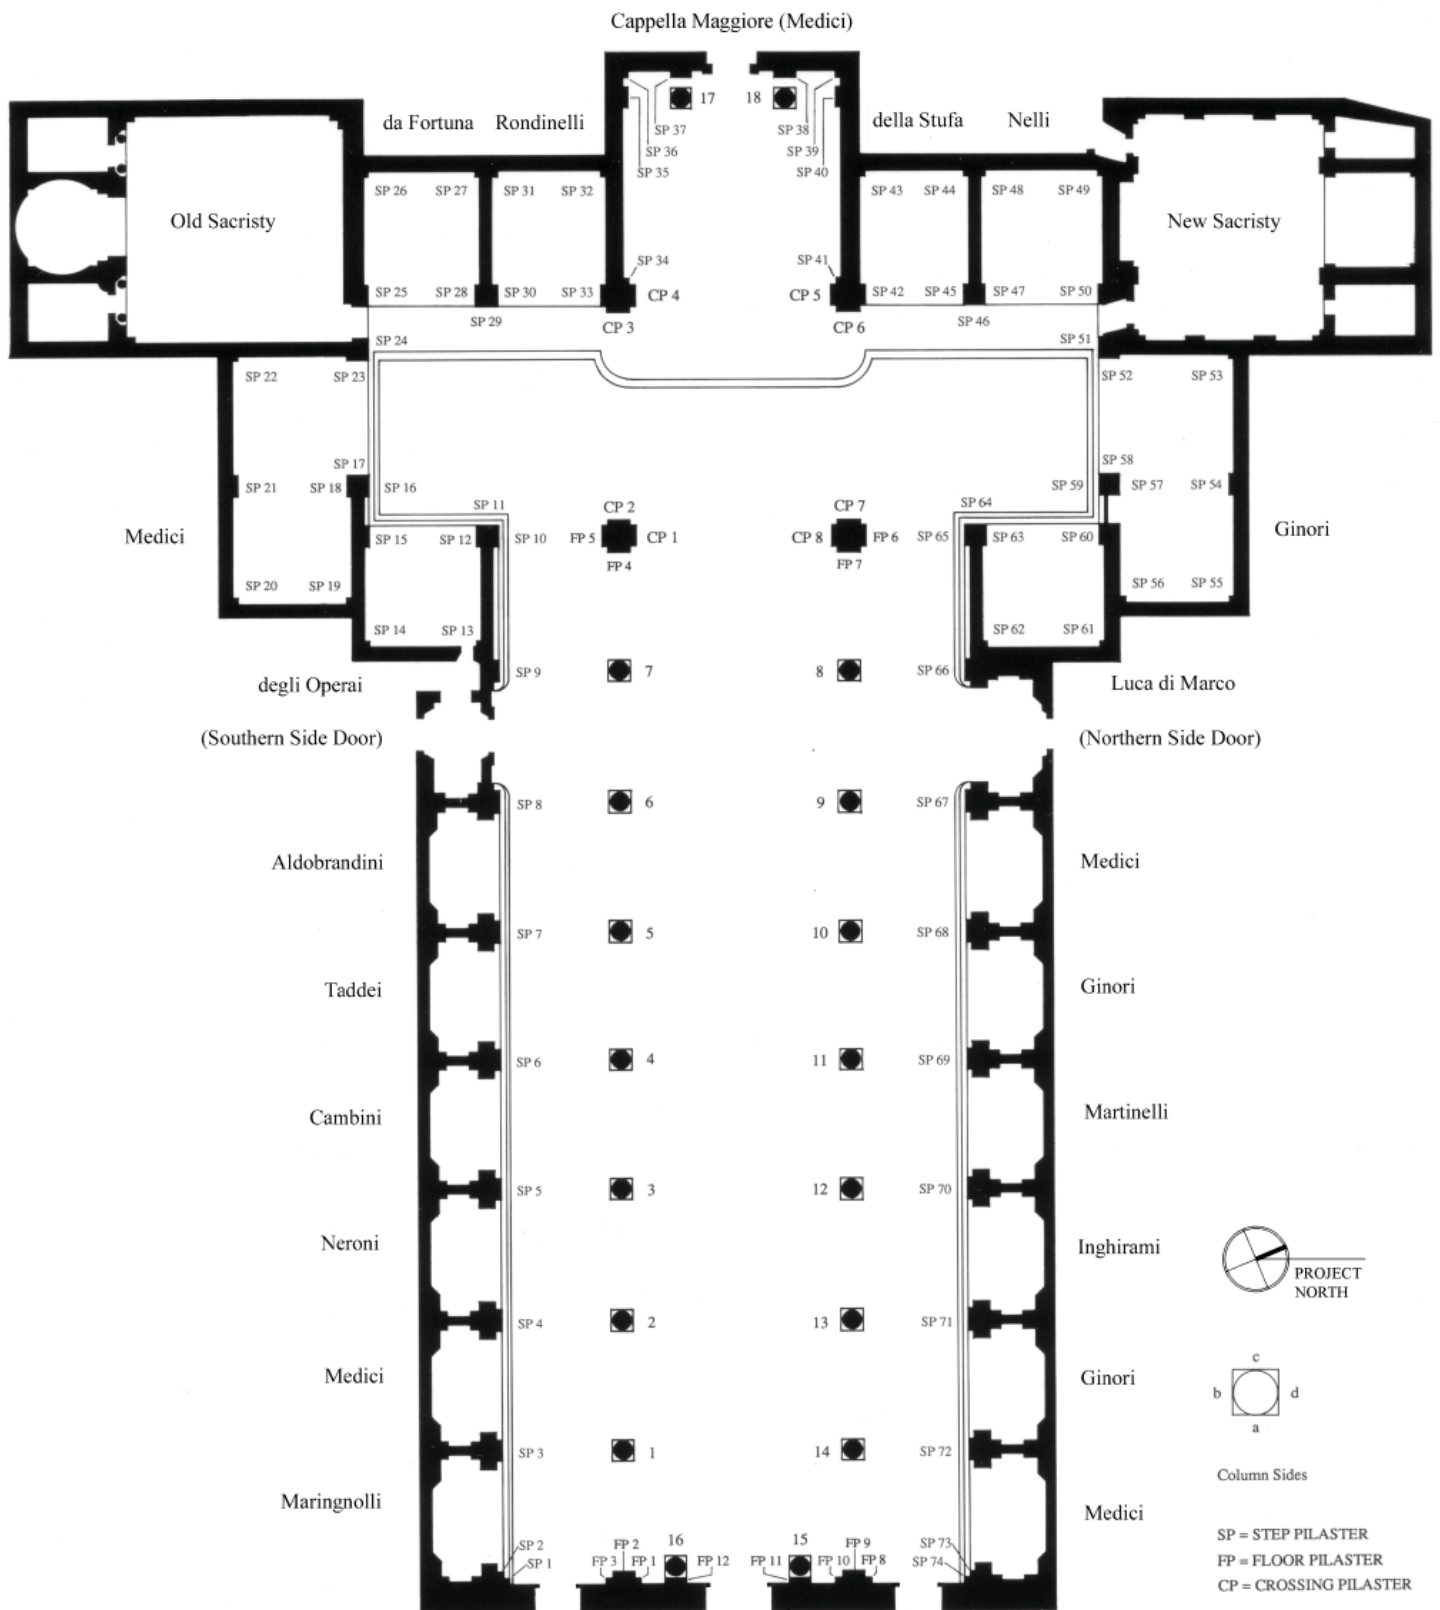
Basilica of San Lorenzo, floor plan with column and pilaster numbers, and original chapel patrons.
